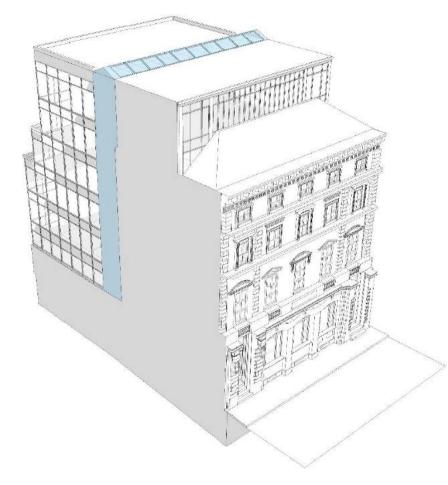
Narrower internal light well created between existing building and new extension, maximising daylight into the building.
